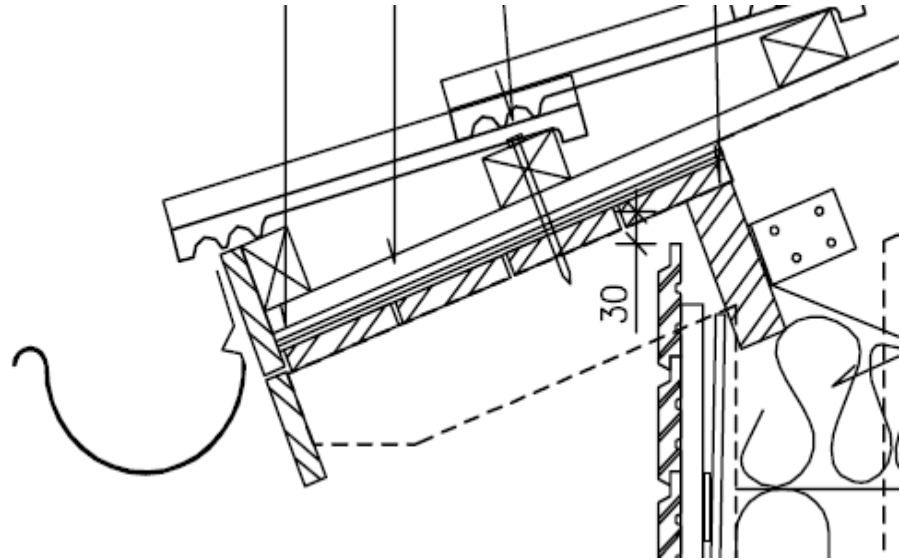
Detail drawing of the upper edge panels, without storm boards, on longer eaves. Nieminen A. 2014. Detail drawing 4.21b.
